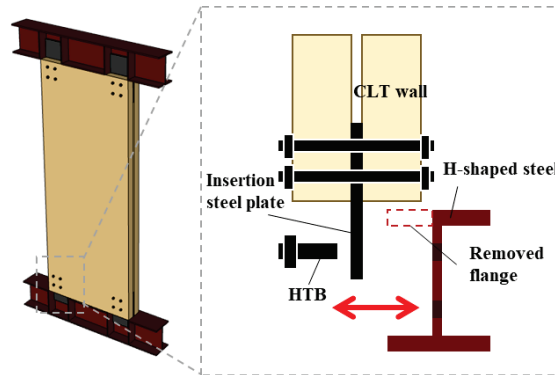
The specification of CLT walls-steel beams of the hybrid system.
